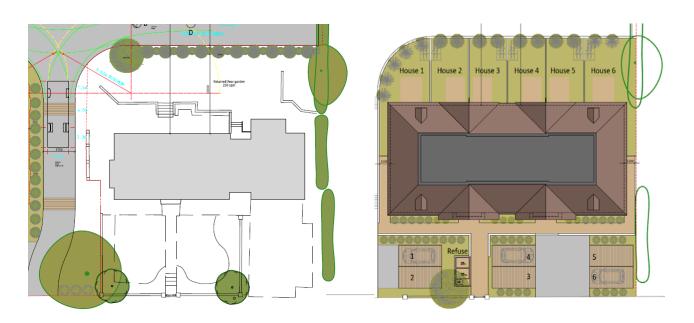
Existing and Proposed Plan Including Landscaping (Indicative only)
